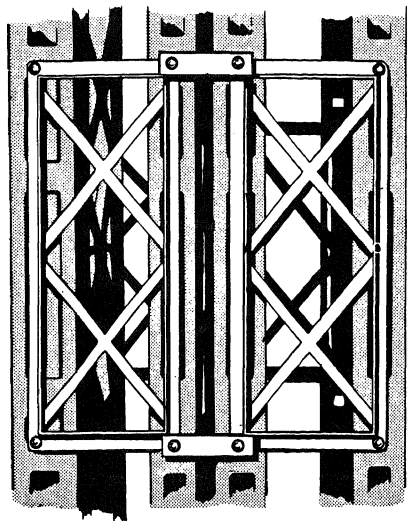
Close-up view of bracing in a quadruple-truss crib pier. Tie plates overlap bracing frames and are held by bracing bolts. Sockets are removed from tie plates and washers from bolts so extra long bolts are required.
